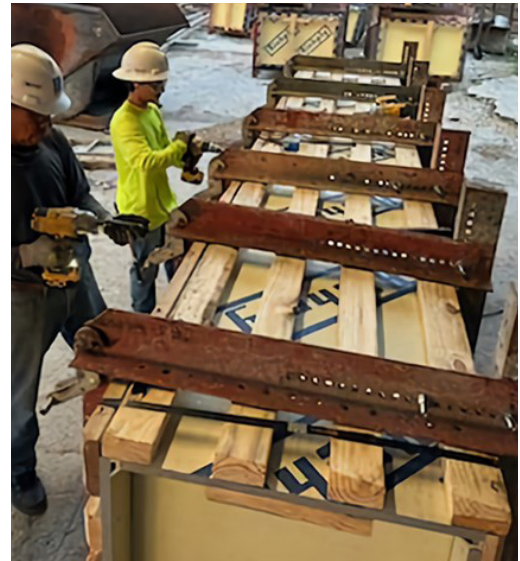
Workers engaged in the assembly (make-up) of a column form. (Image courtesy of Ceco Concrete Construction.)
